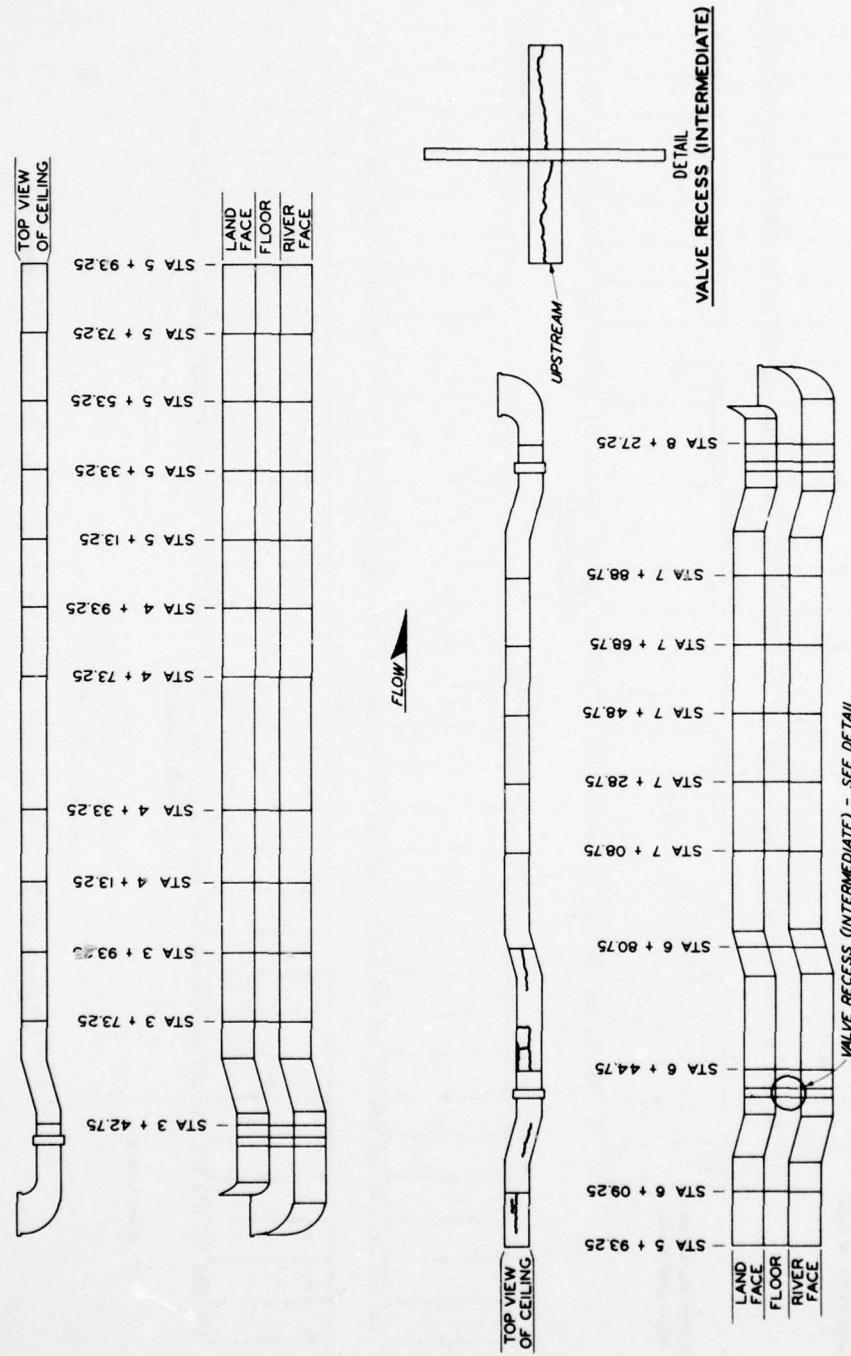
Surface cracks, river wall supply tunnel, Troy Lock and Dam, Troy, New York.
